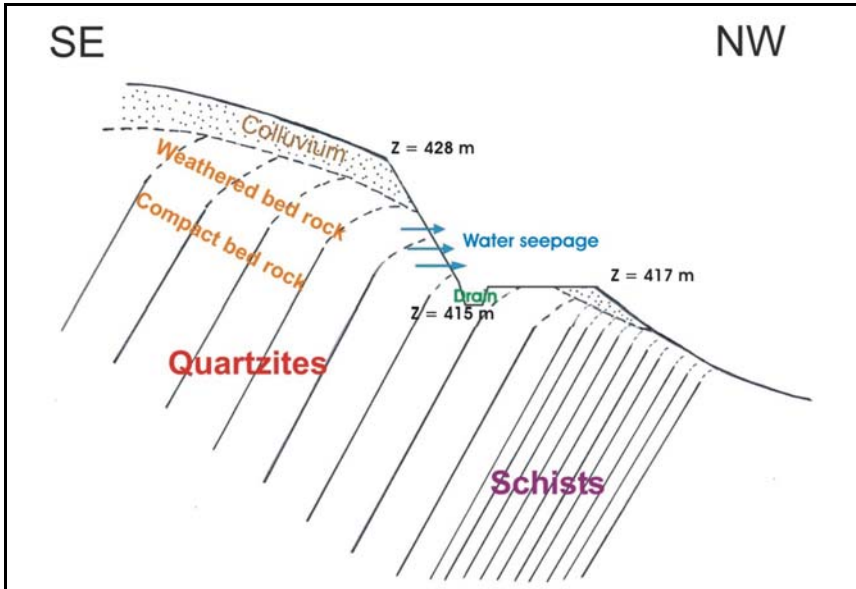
Schematic SE-NW transverse cross-section showing the reshaped slope and the position of the drain.
